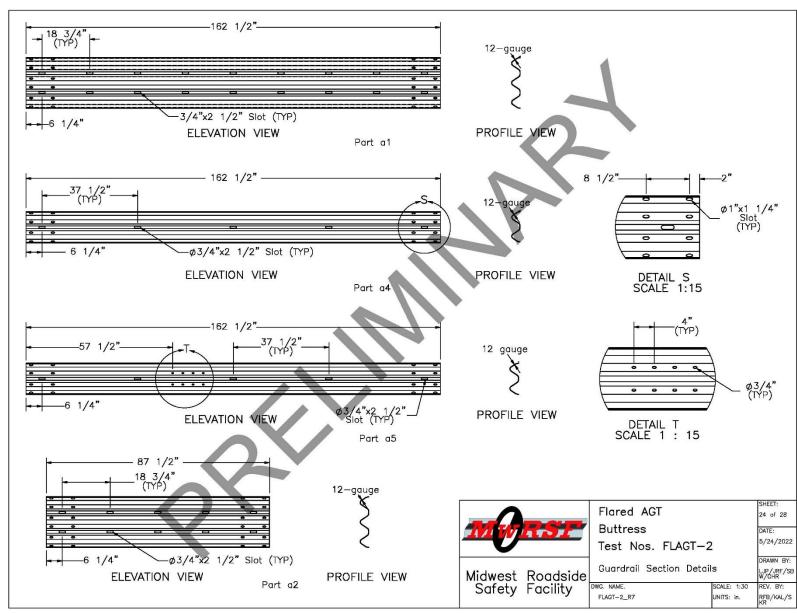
Guardrail Section Details, Test No. FLAGT-2
